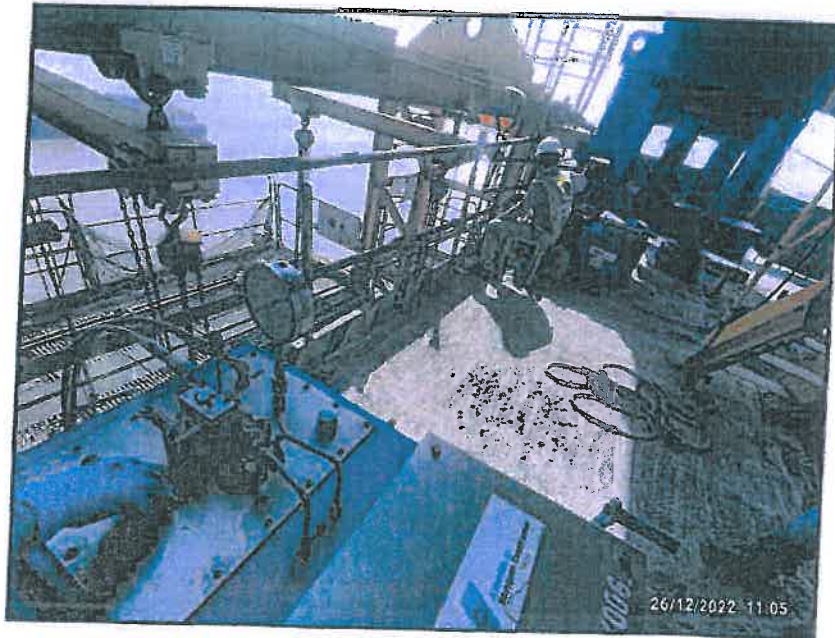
First stage stressing in progress at Span MP 153-154 RHS.
